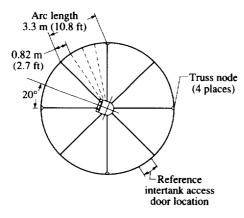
Second floor of lunar habitat. Floor outside diameter, 8.4 m (27.5 ft); Total floor area minus Area of access opening, 54 m<sup>2</sup> (584 ft<sup>2</sup>).
